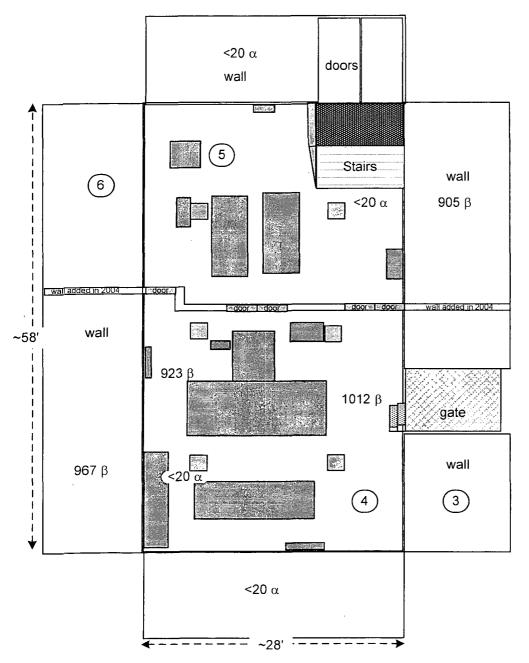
Building 2 Service Corridor Section B Elevator Machinery Room Breezeway D Final Suveys
